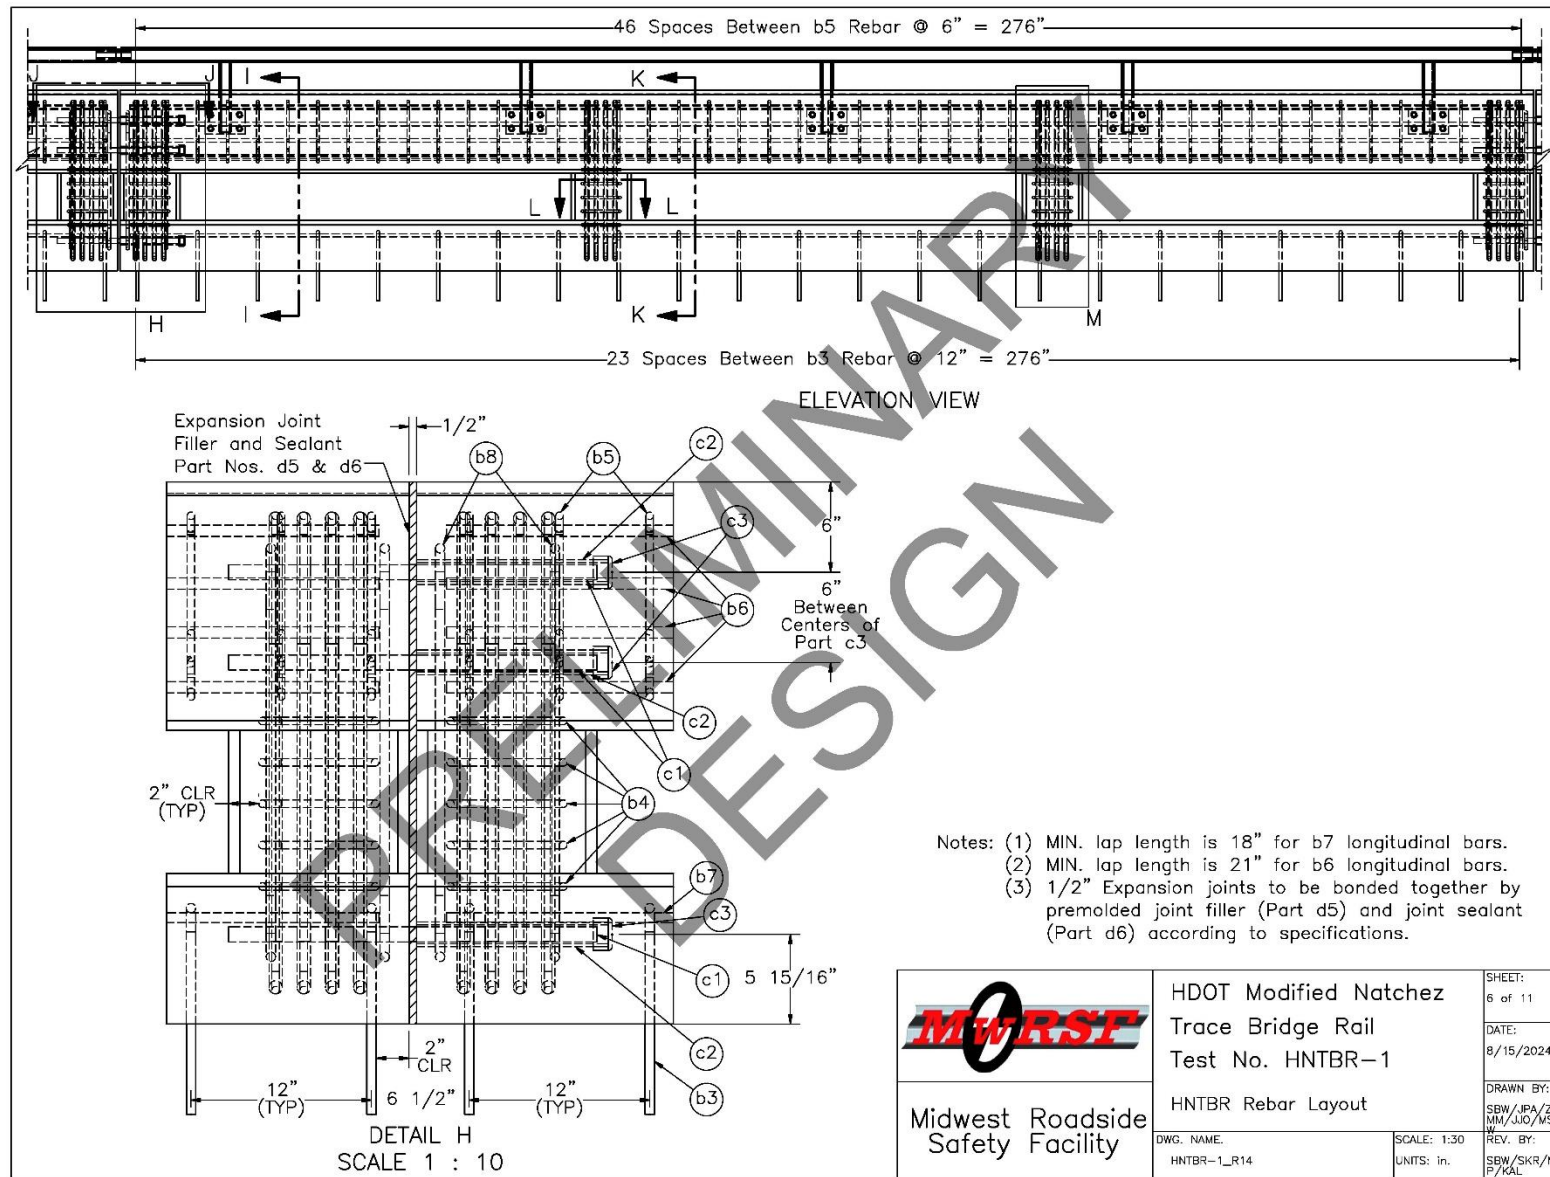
Rails Rebar Detail, Test No. HNTBR-1
